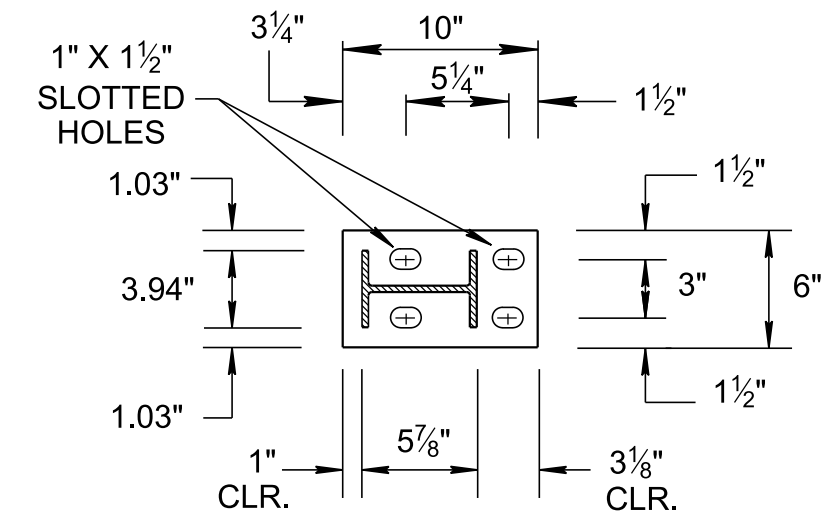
DETAIL FOR CONCRETE DECK WITH 6" TO 1'-0" OF ROADWAY FILL COVER
